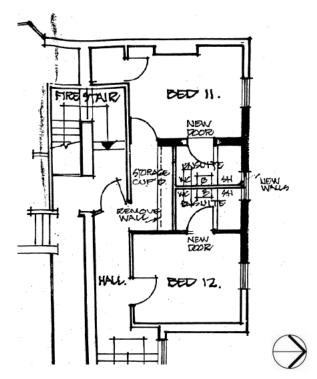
Fortune of War Hotel, 137 George Street, alterations to the second floor (rear), 1989. Source: PMNSW ROX 410 DA 0019/DR & ROX 410 DA 0020/DR – details.
